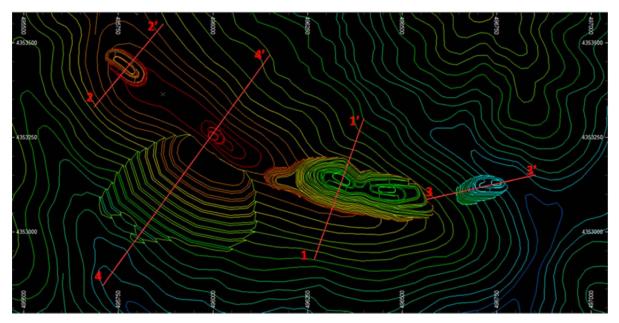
illustrates the Kubaşlar site overview, waste dump and pit design.
